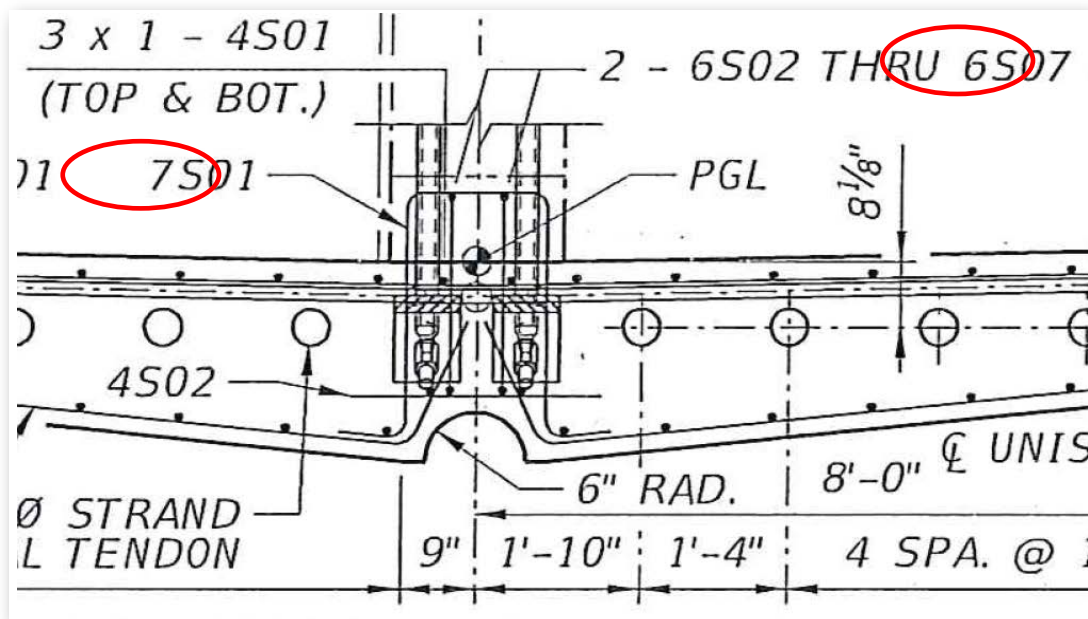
Superstructure Deck cross section, node bars 7501 and 6507 indicated.⁷⁵
